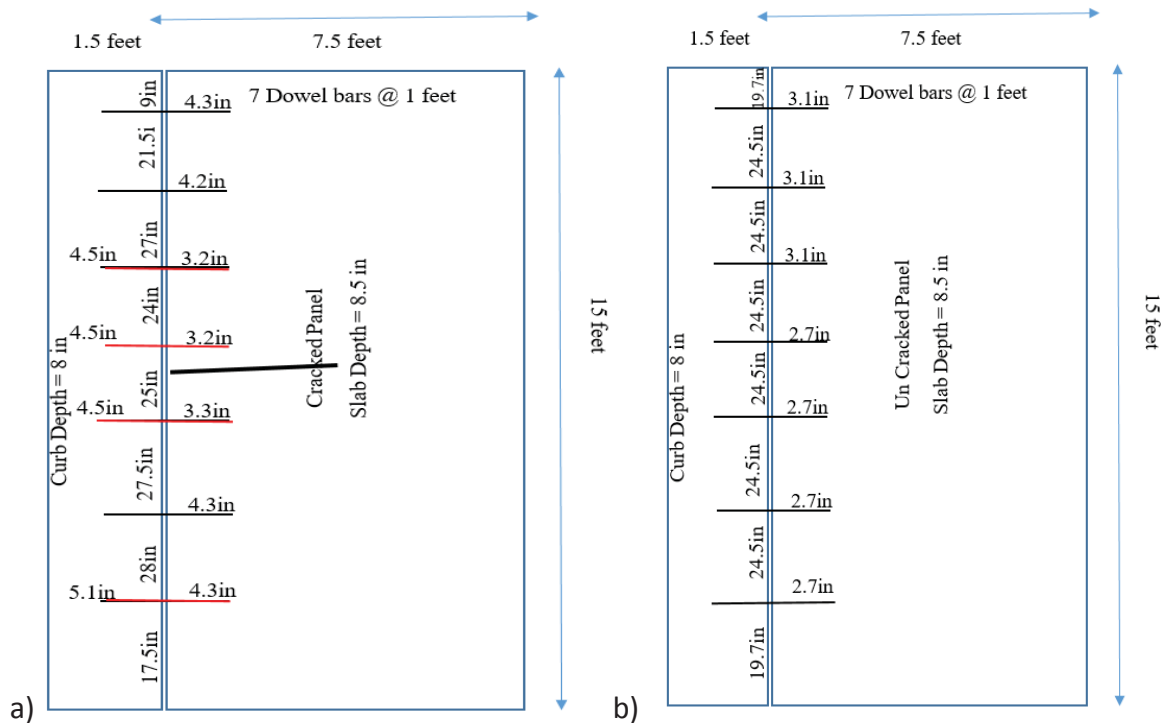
Rebar scheme: (a) cracked panel; (b) uncracked panel on John Street extension.
